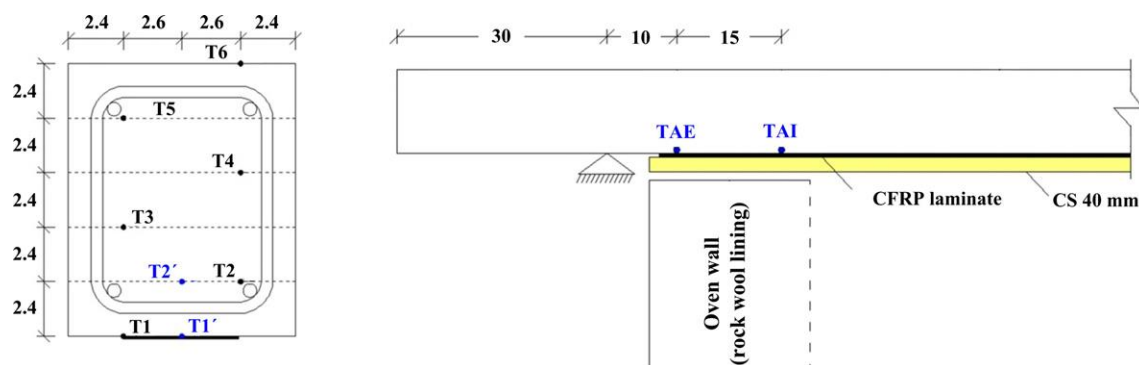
Position of thermocouples: mid-span section of all beams (left) and anchorage zone of beam CS40 (right), dimensions in cm [56]
